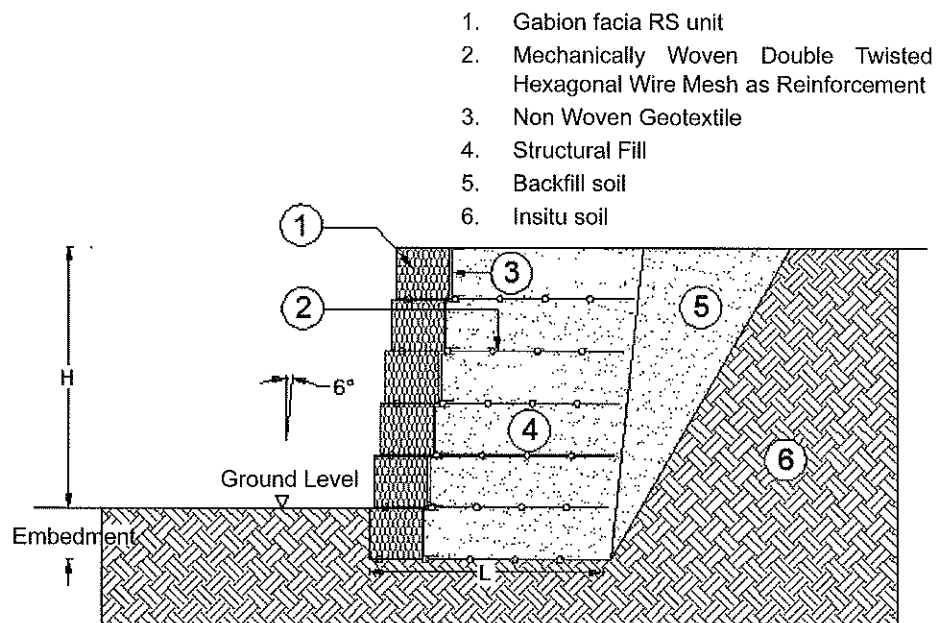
Typical Photo of Reinforced soil wall with Gabion Facia
